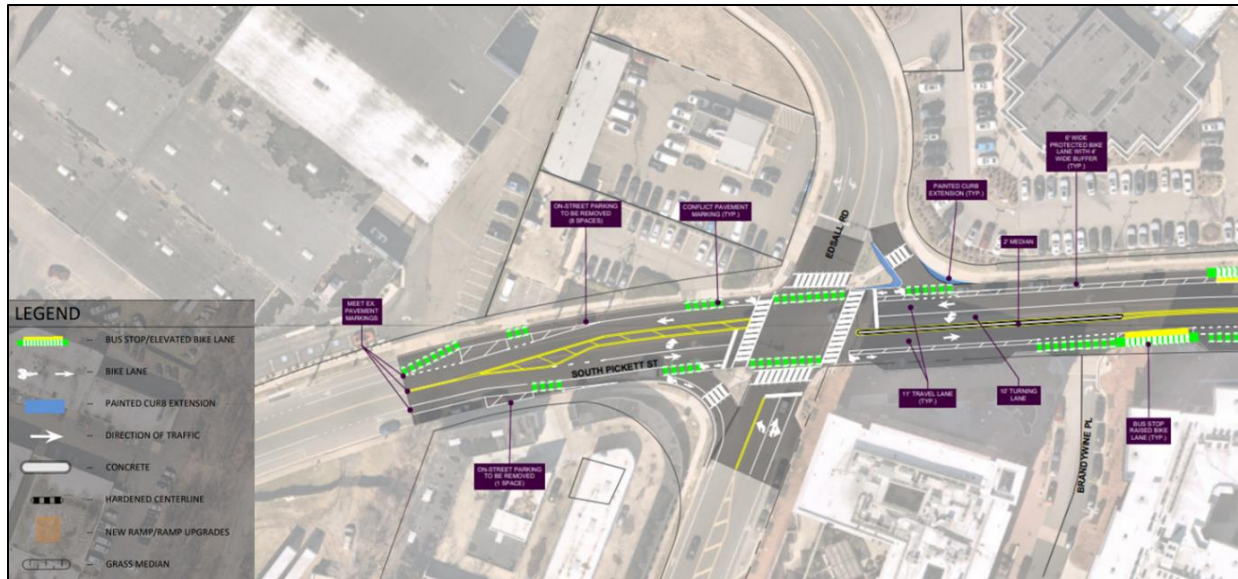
S Pickett Street Corridor Improvements: Concept for Edsall Road and S Pickett Street
